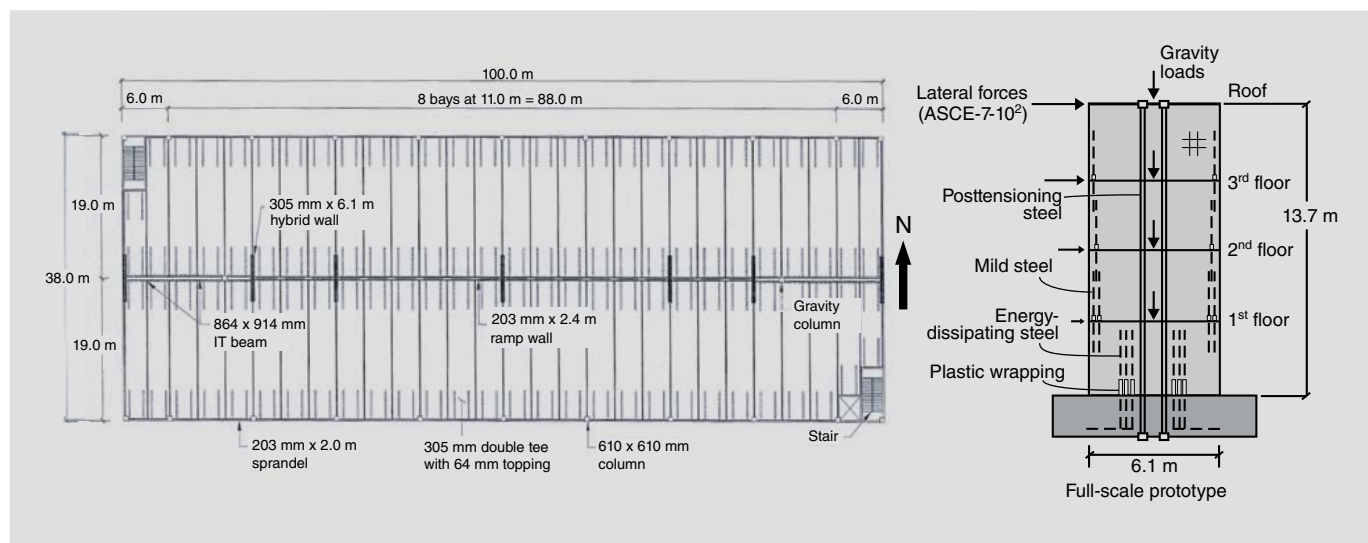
Plan view of full-scale structure and elevation view of full-scale wall. Note: 1 mm = 0.0394 in.; 1 m = 3.28 ft. Drawing courtesy of Consulting Engineers Group, Texas
